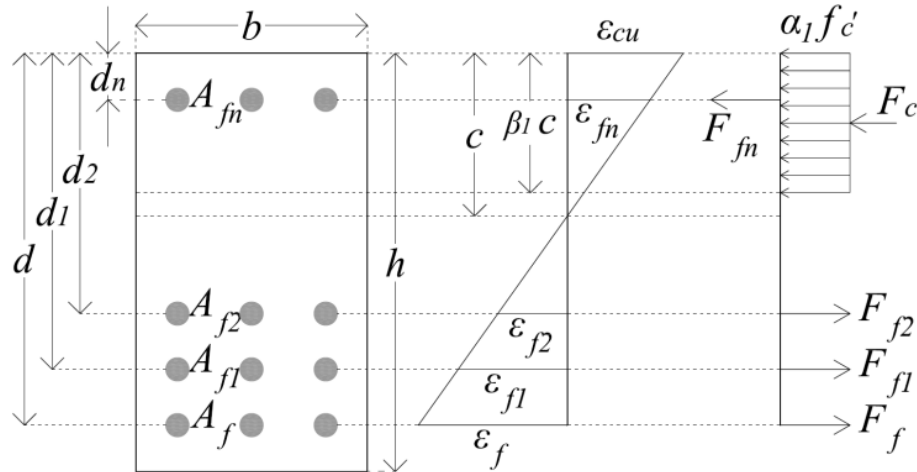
Concrete beam cross-section reinforced with $n + 1$ layers of FRP bars
